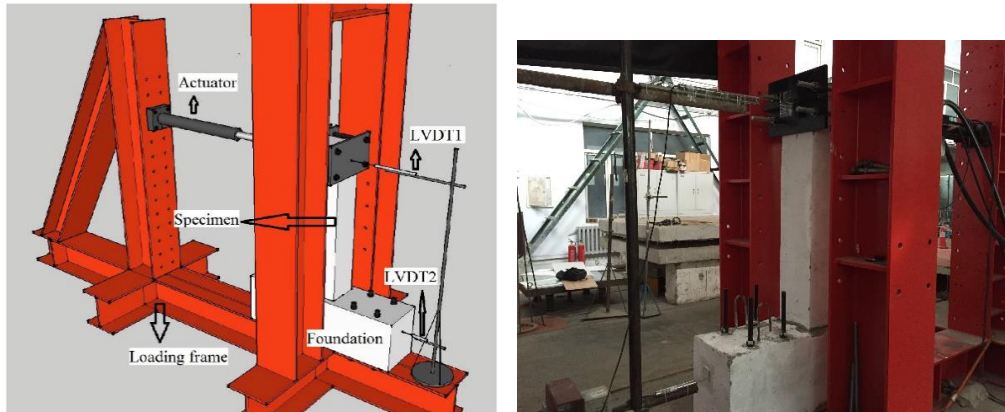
Loading frame of the column and arrangement of the LVDTs
